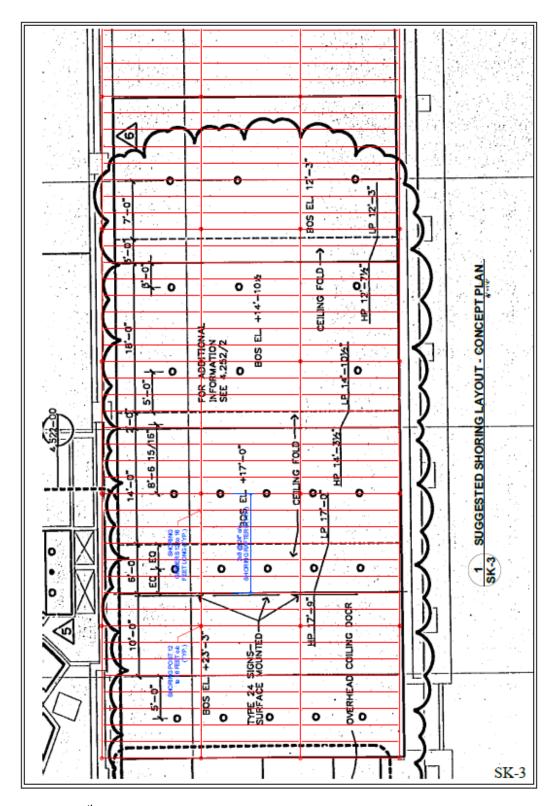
14th Street North Ramp – Sketch for Shoring Suggested Concept Plan
